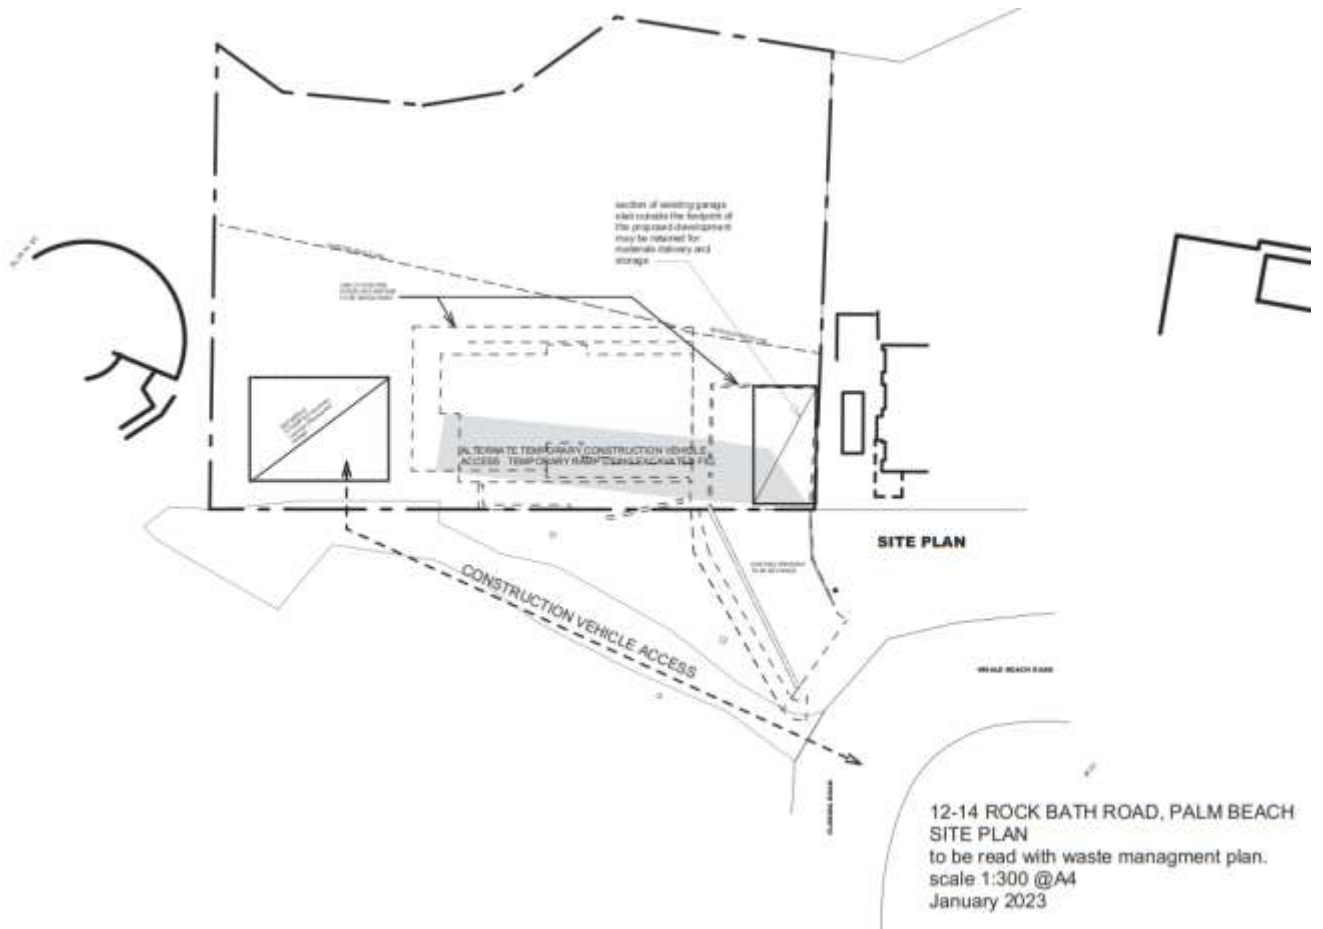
Site Plan as shown in the Waste Management Plan, indicating a Materials Stockpile on the southern side of the site, accessed from the existing driveway.
